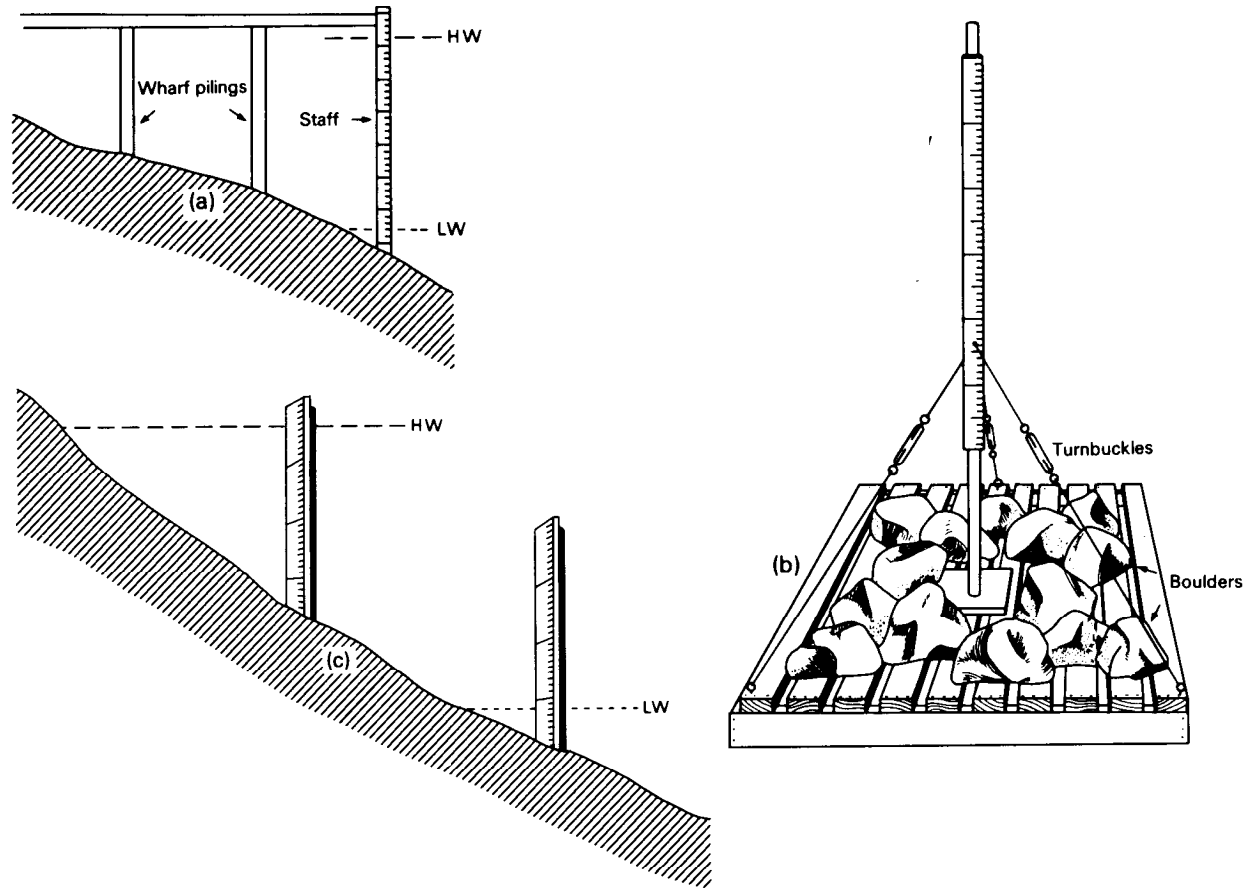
Staff gauge installations (a) on wharf piling, (b) on submerged platform and (c) on long sloping beach.
